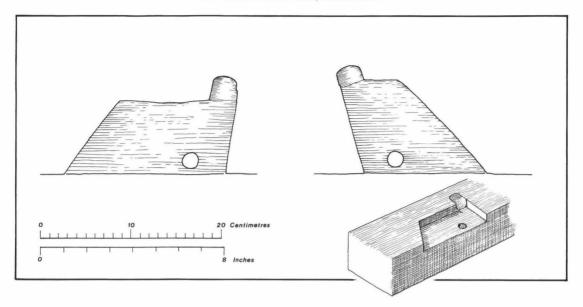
Brace mortices cut in half in a re-used joist in the belfry floor. The 'noses' were formed by the auger used to pre-drill the mortices.
